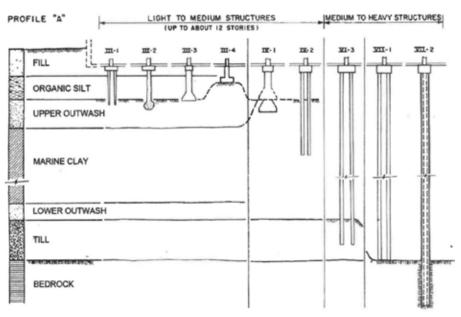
Deep foundations used throughout the decades. (Courtesy of Woodhouse and Barosh, Civil Engineering Practice, *Journal of the Boston Society of Civil Engineers*, 2011-12.)
